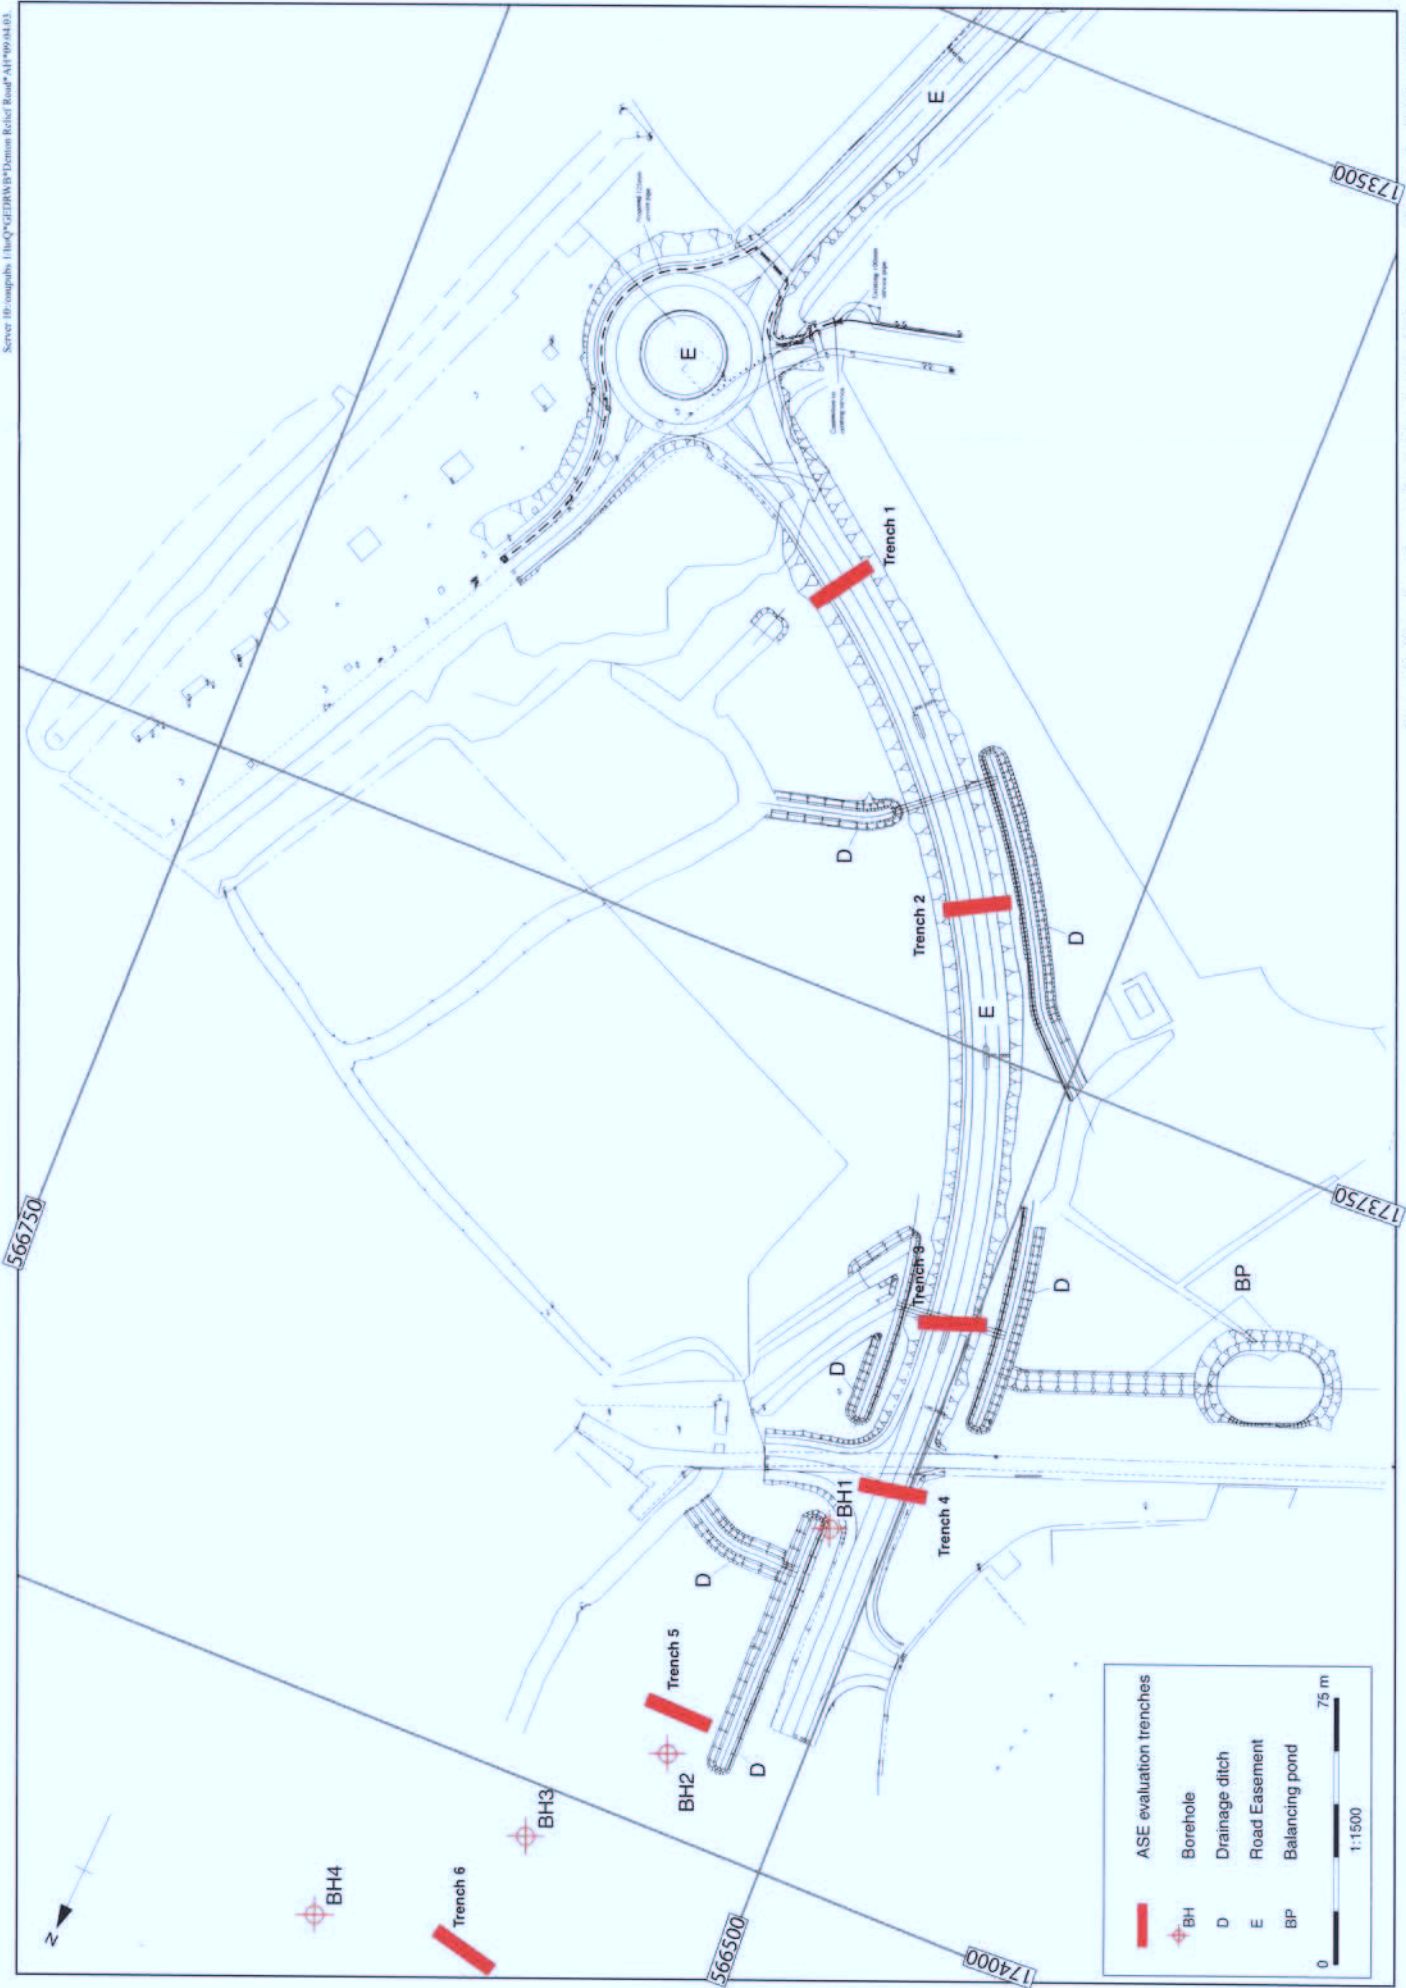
Site plan of area of watching brief with locations of boreholes BH1 to BH4
